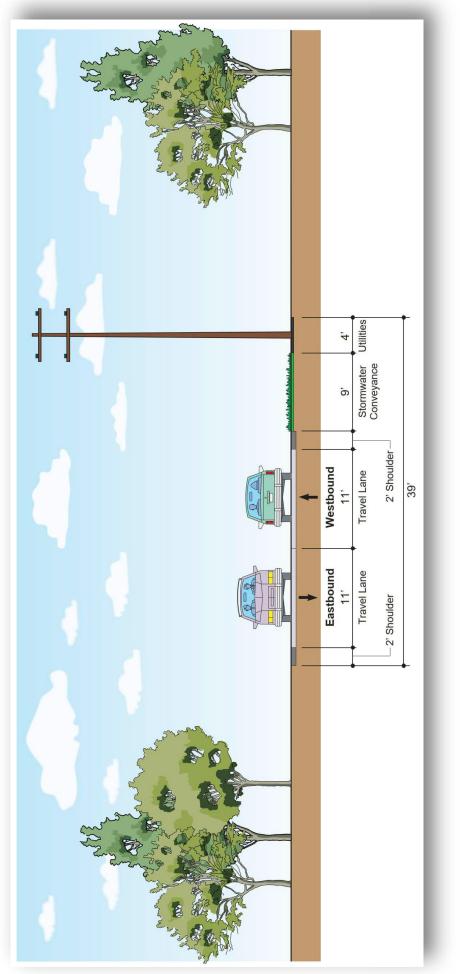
Conceptual Access Alternative 7 Option B Typical Section (2-foot Shoulders, No Shared Use Path)
